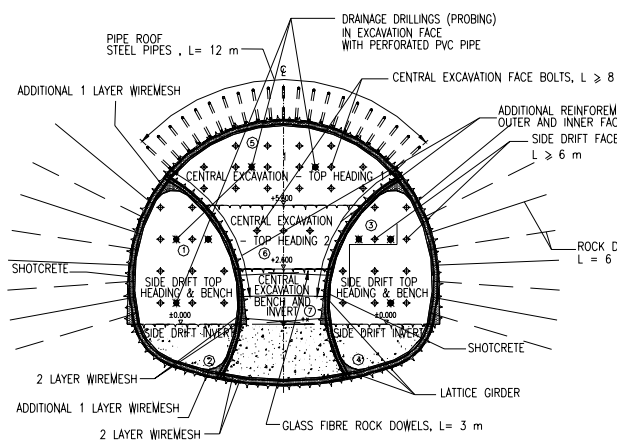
Typical Section of Side Wall Galleries Tunneling (for the underpass of the Second Freeway).
